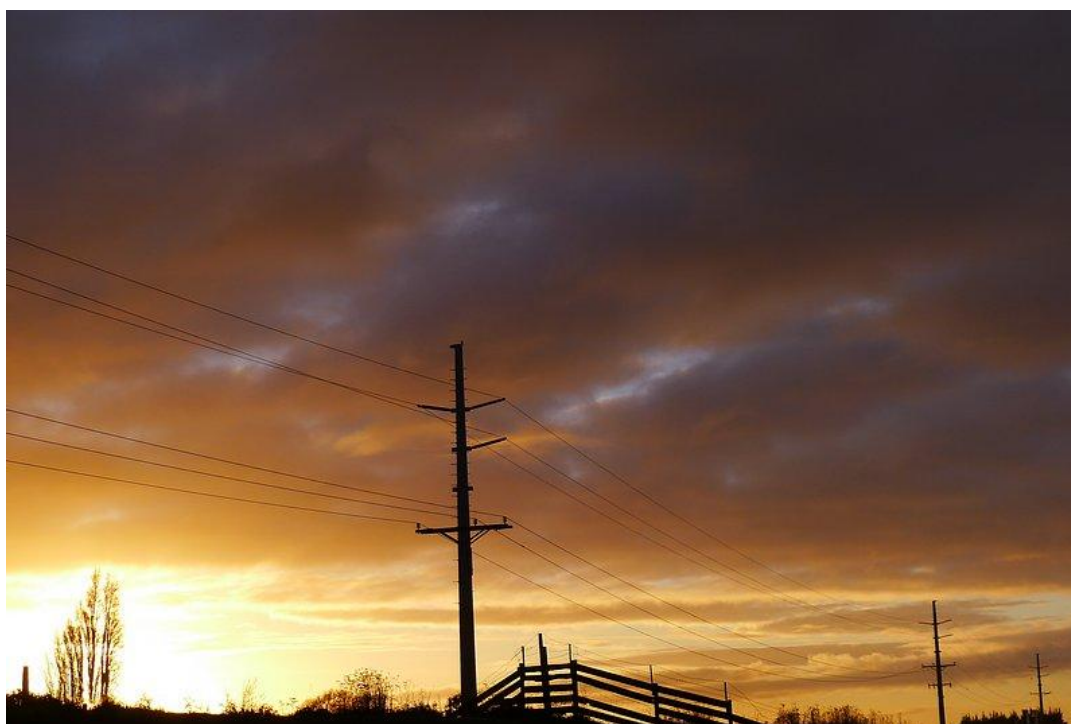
renewed 33kV Line Lansdowne Park to Riverlands - Steel poles
